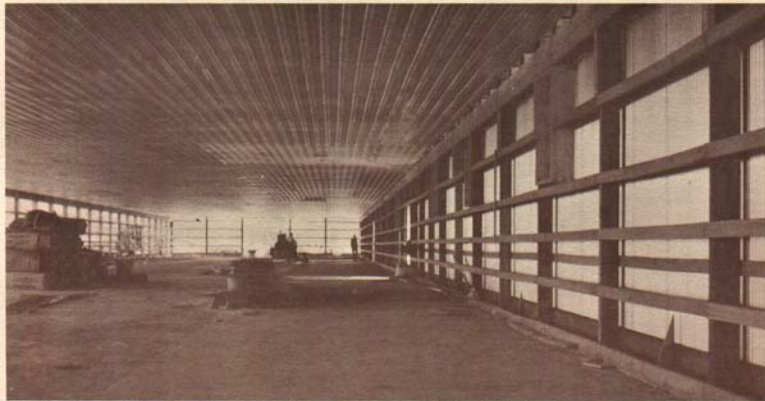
Square pole framing for a windowless poultry house. Building is lined inside and out with metal. Blanket insulation is placed in the wall horizontally.
